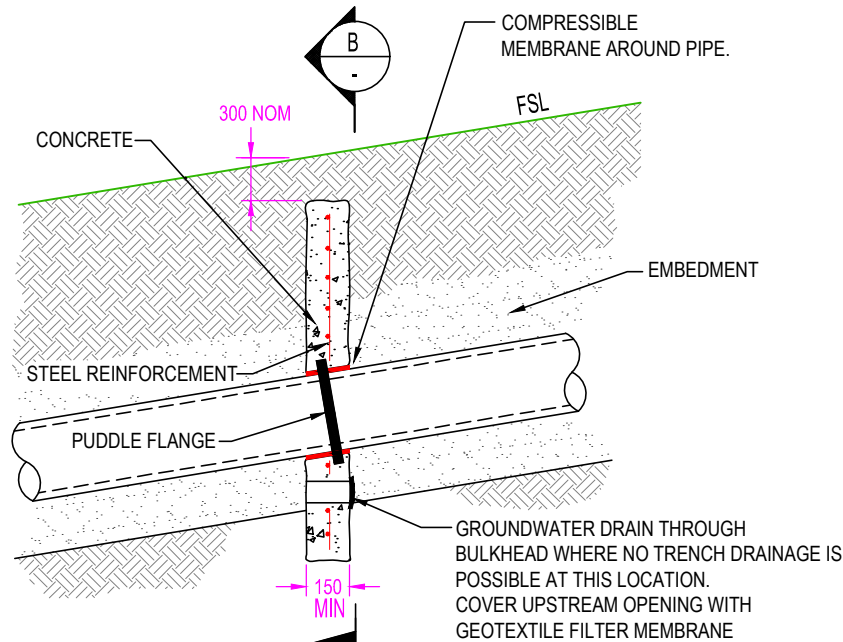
A: CONCRETE BULKHEAD (SECTION)
